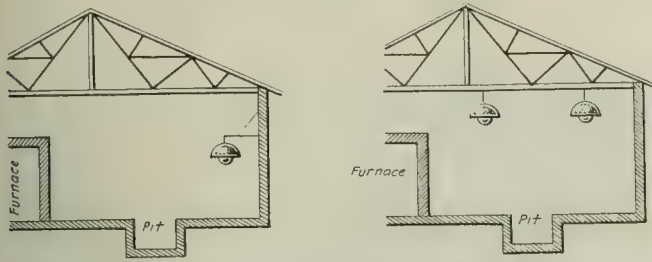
POOR AND IMPROVED PLAN OF LIGHTING OPEN-HEARTH FURNACE BUILDING
